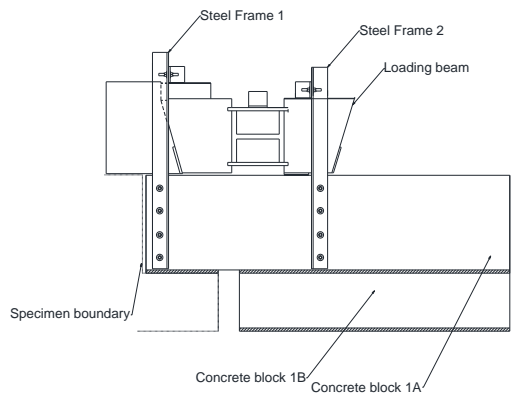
Side view of hold-down frames in test setup for Specimen 12
